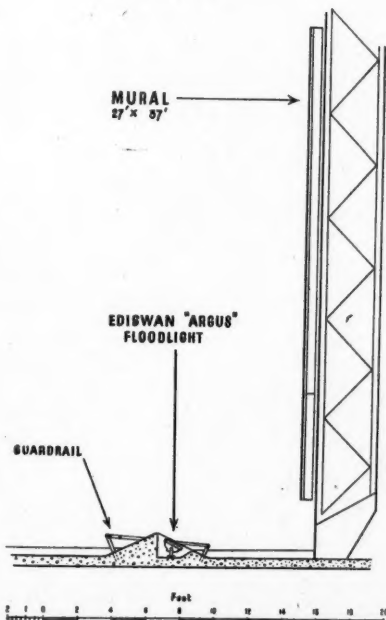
(Below) Lighting arrangement for the mural outside the Sea and Ships building.
